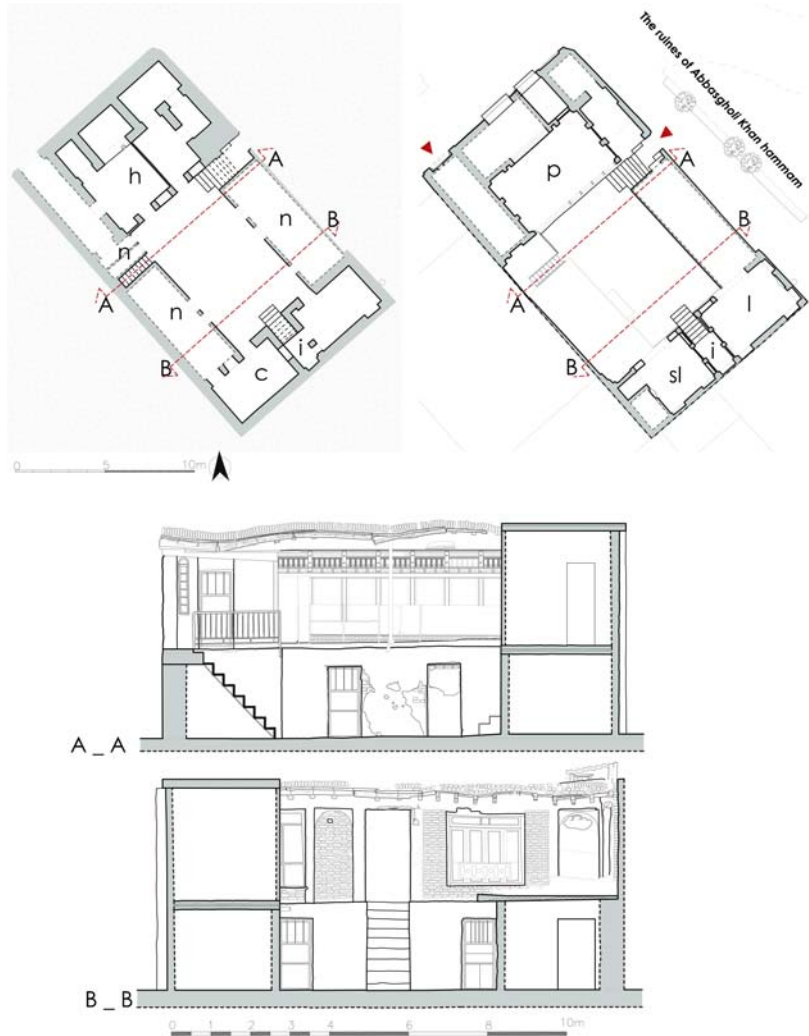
Tehrani's House: floor plans and façades, h: *Hozkhaneh*, n: new constructions, c: cooking room, p: principal chamber, sl: sleeping room, i: *Iwan*, l: living room
